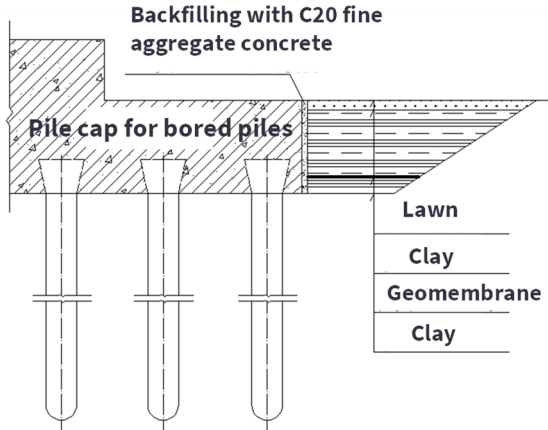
Cross-sectional view of anti-seepage and anti-impact measures for tower foundation plinth.
